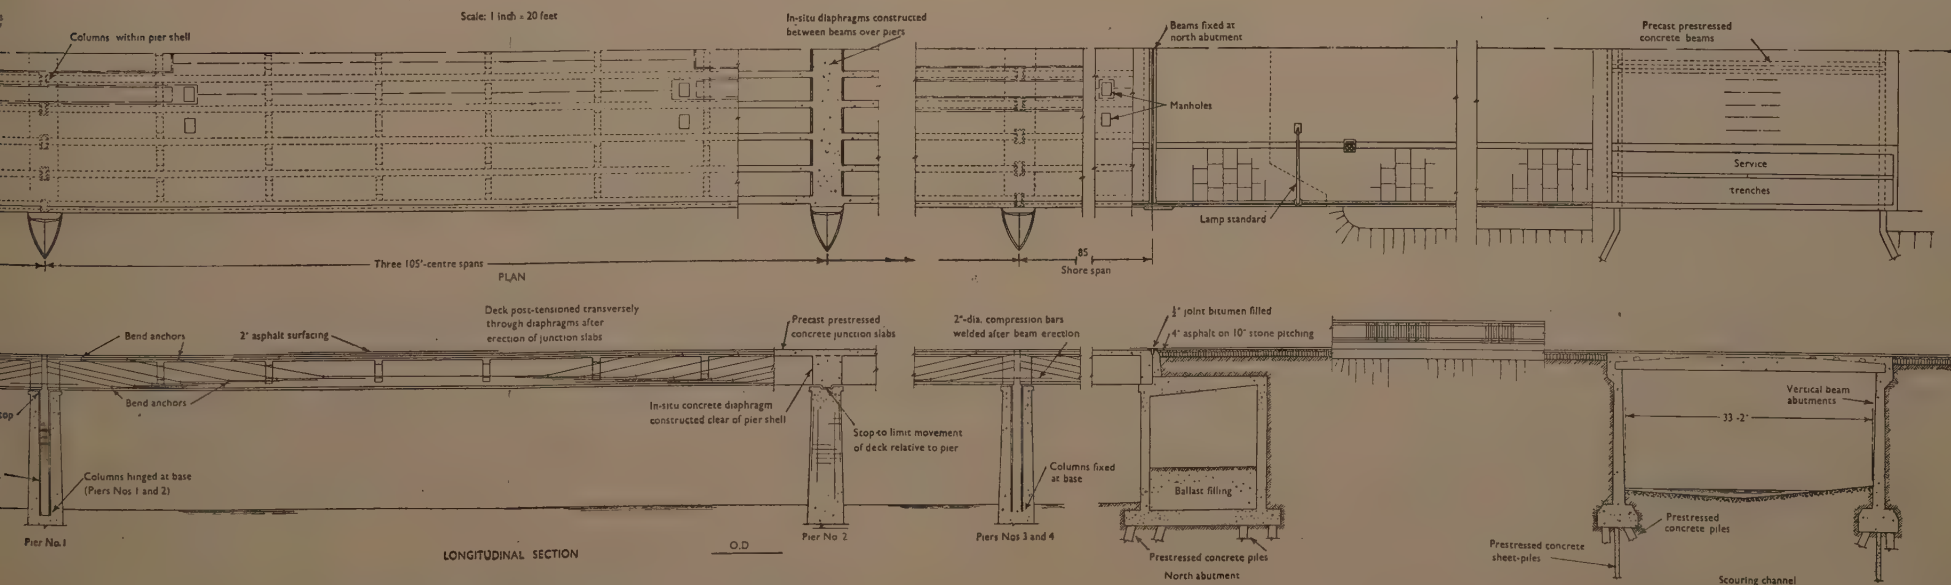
STRUCTURAL ARRANGEMENT OF BRIDGEWORK
